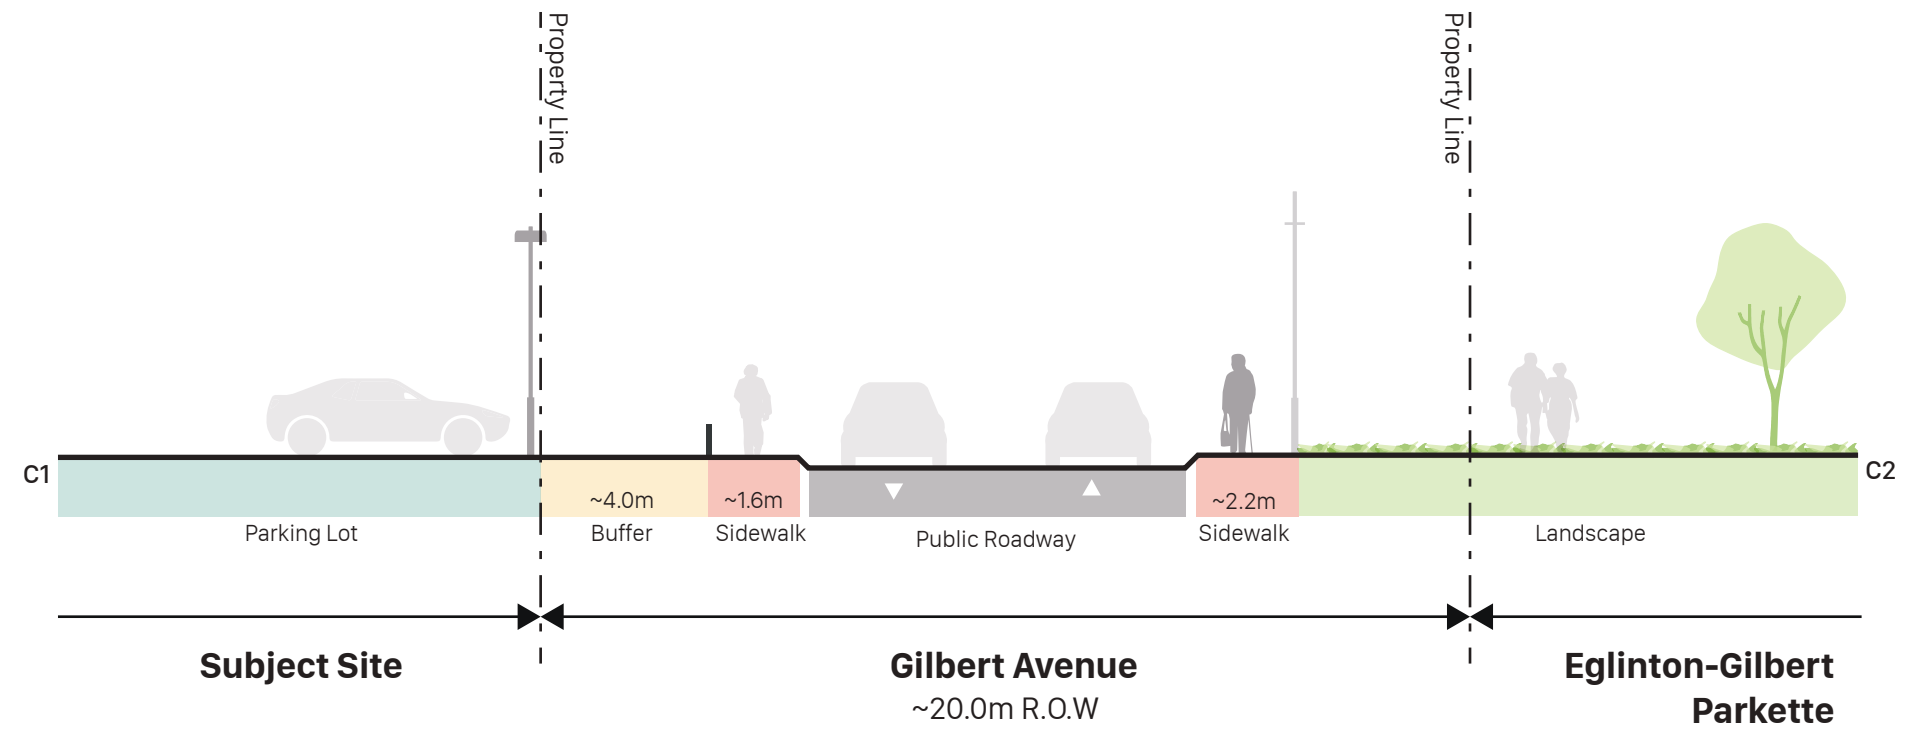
Section C1-C2 Gilbert Avenue (Existing)
